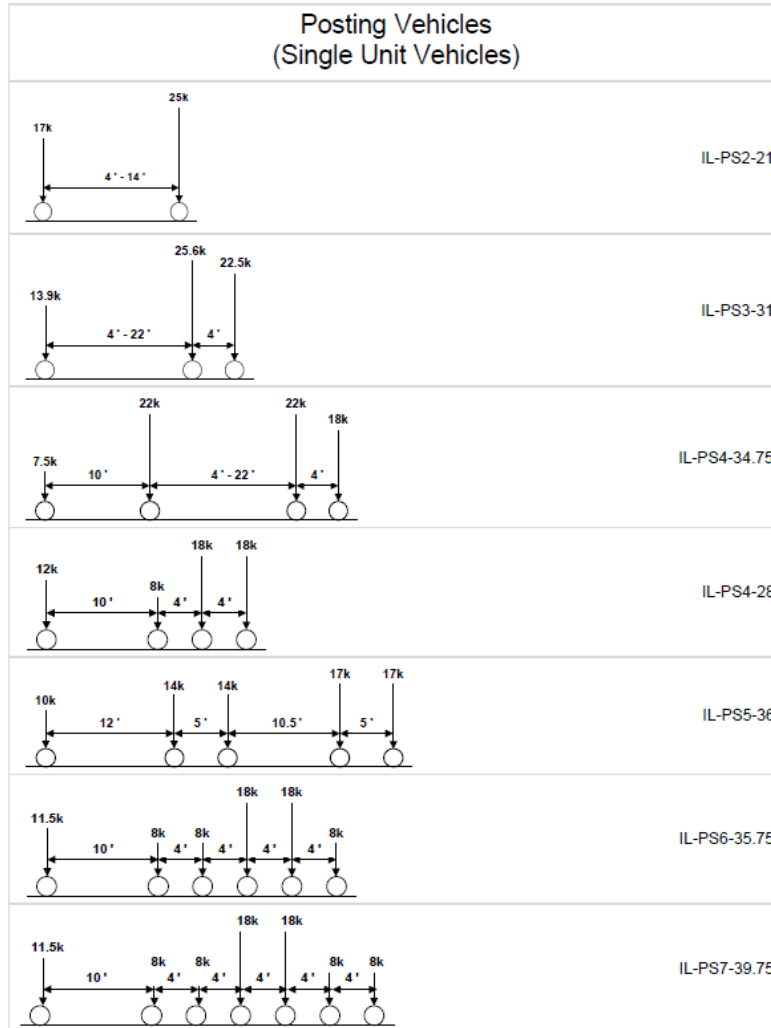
Illinois posting trucks for legal loads—single units.
